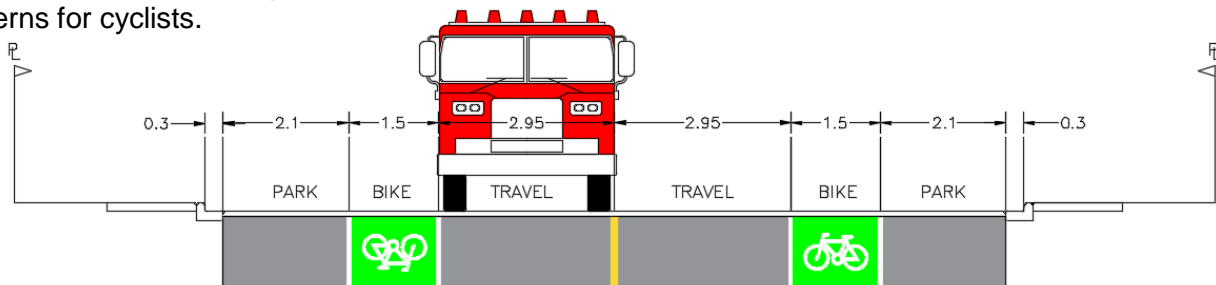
Existing 7th Avenue cross section with two travel, parking, and bike lanes
